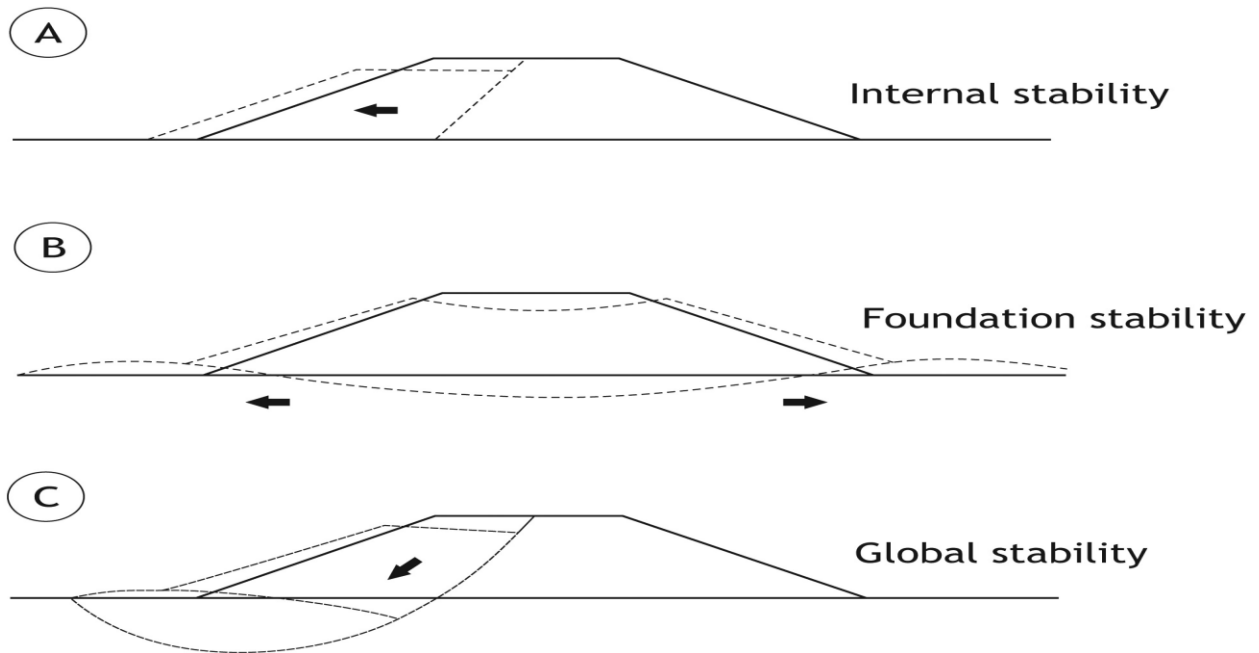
5 Failure modes of unreinforced embankments: (A) lateral sliding of the embankment, (B) failure in foundation clay Jewell, (1982), (C) overall failure embankment-foundation.
